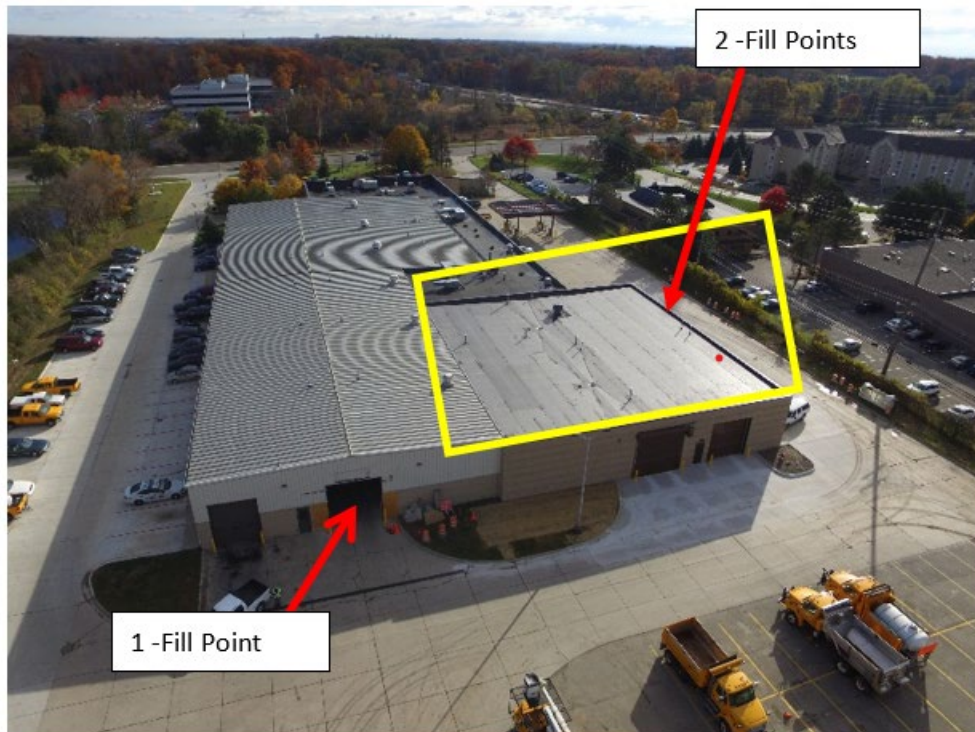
Farmington Hills, MI Building Addition (In Orange) - Liquids Storage and Fill Points; Off-Season - Equipment Storage (9,000 Sq Ft)
